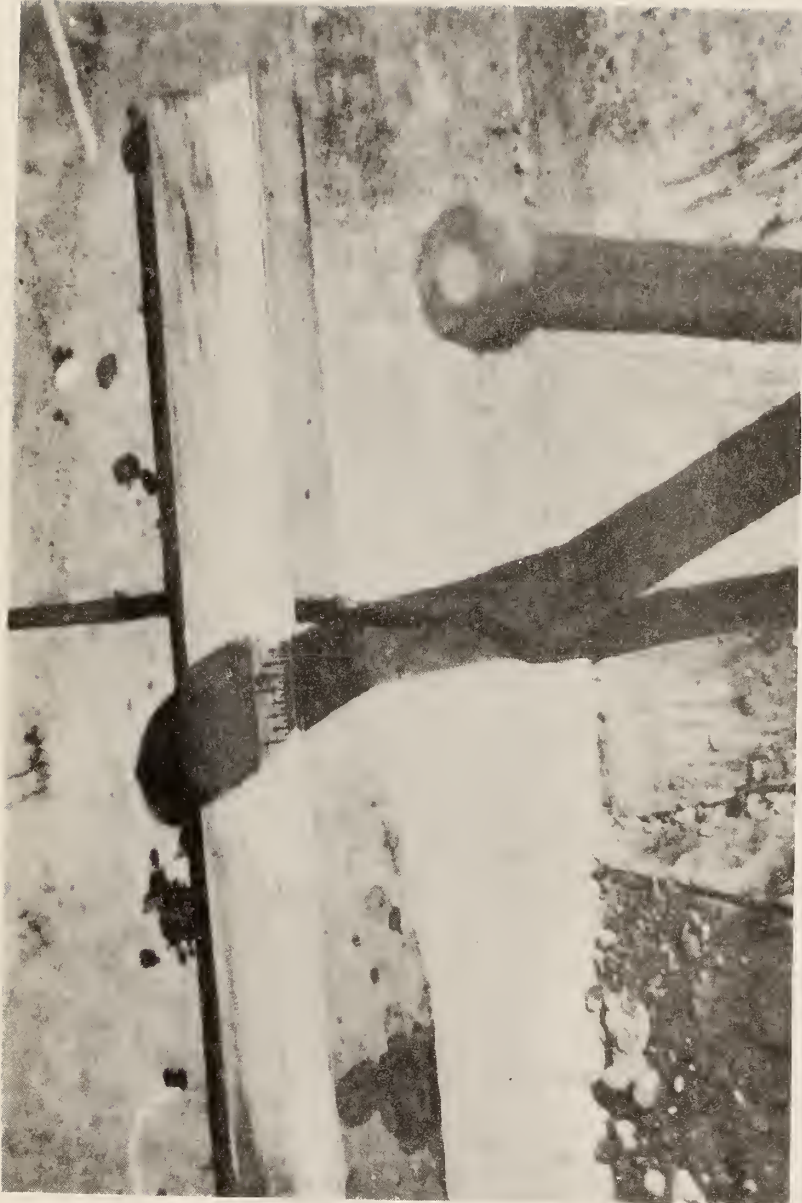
Brittle fracture origin at intersection of lateral attachment and flange plate.
